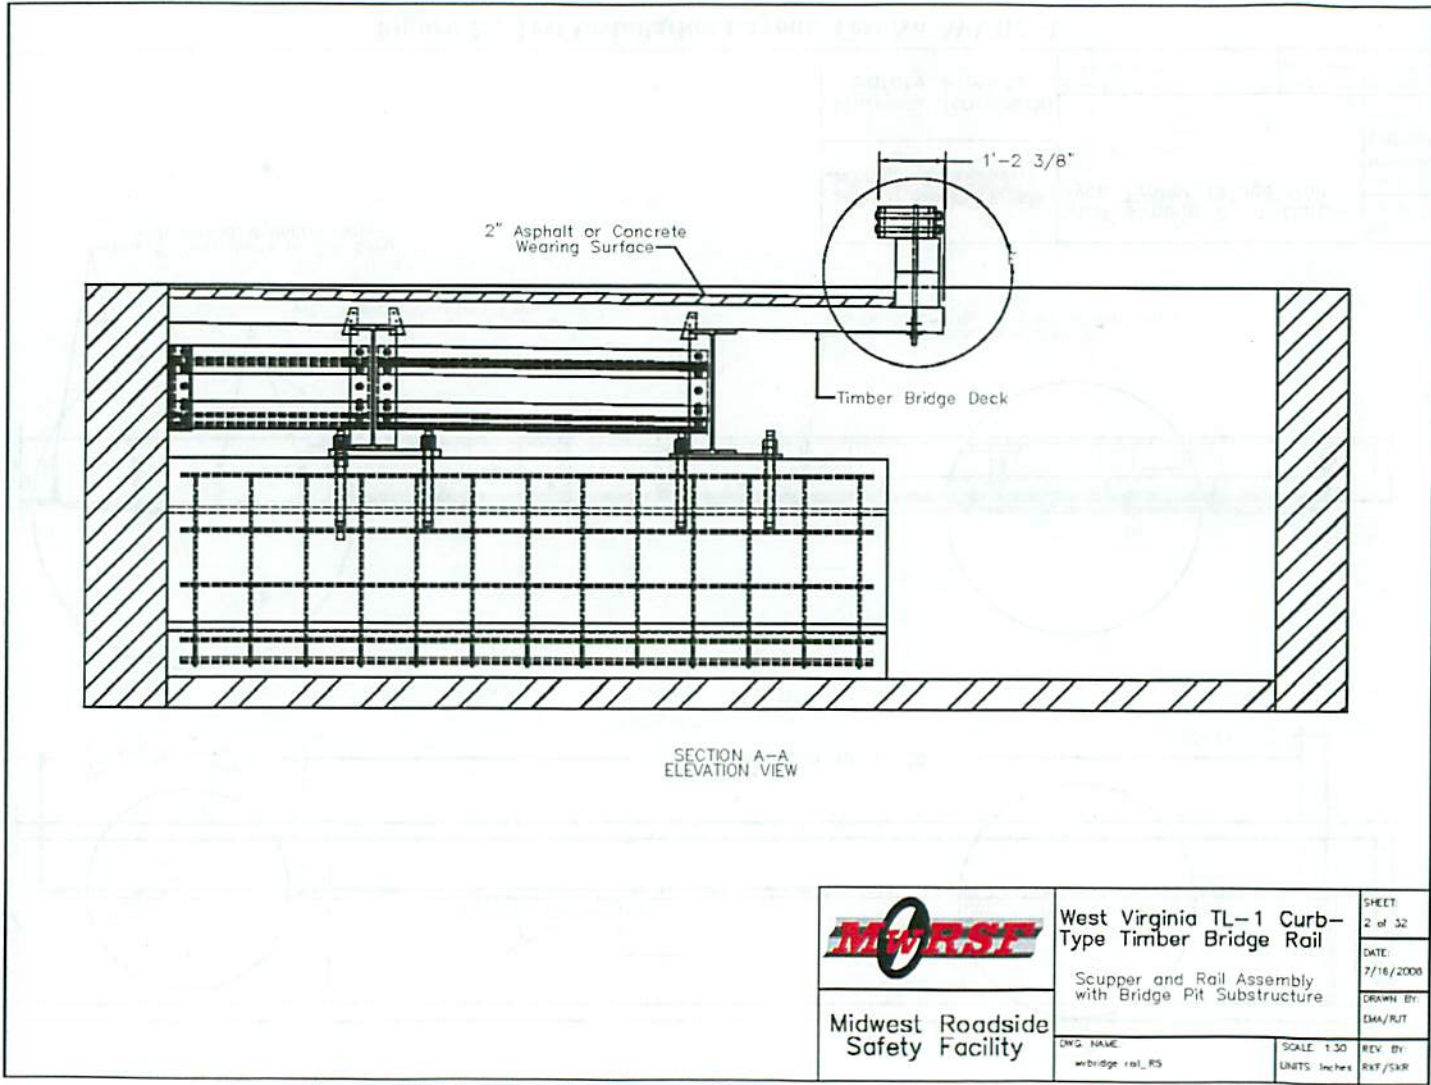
Test Installation and Substructure, Test No. WVBR-1
